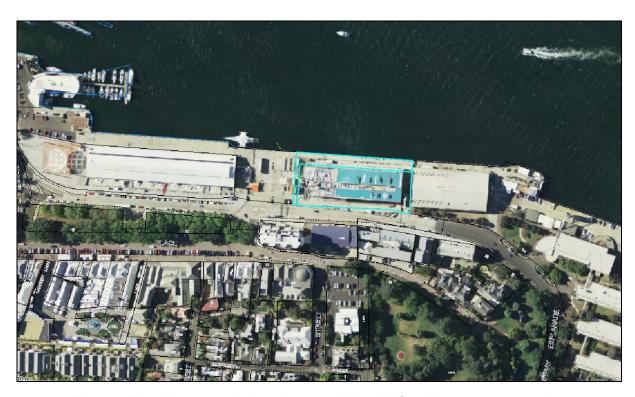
The subject site is bordered in blue, with the IMAS building under construction.
